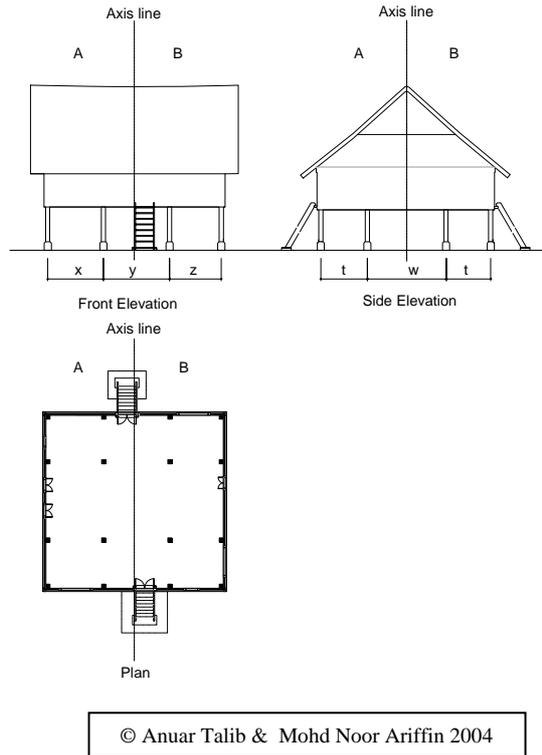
Plan, Front and Side Elevation of *Kutai* Tok Sedera T16 showing the symmetrical and asymmetrical of dimension and location – Front Elevation: dimension ‘x’, ‘y’ and ‘z’ is different and the Plan view indicates location of the stairs are not aligned with one another.
